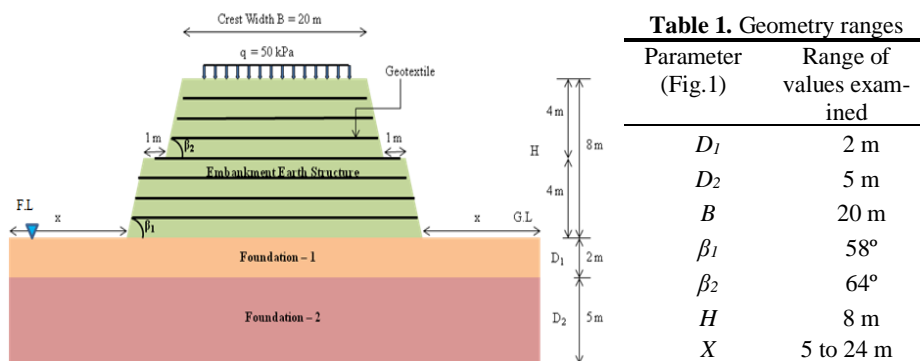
Geometry of models (Reinforced Earth Embankment)
